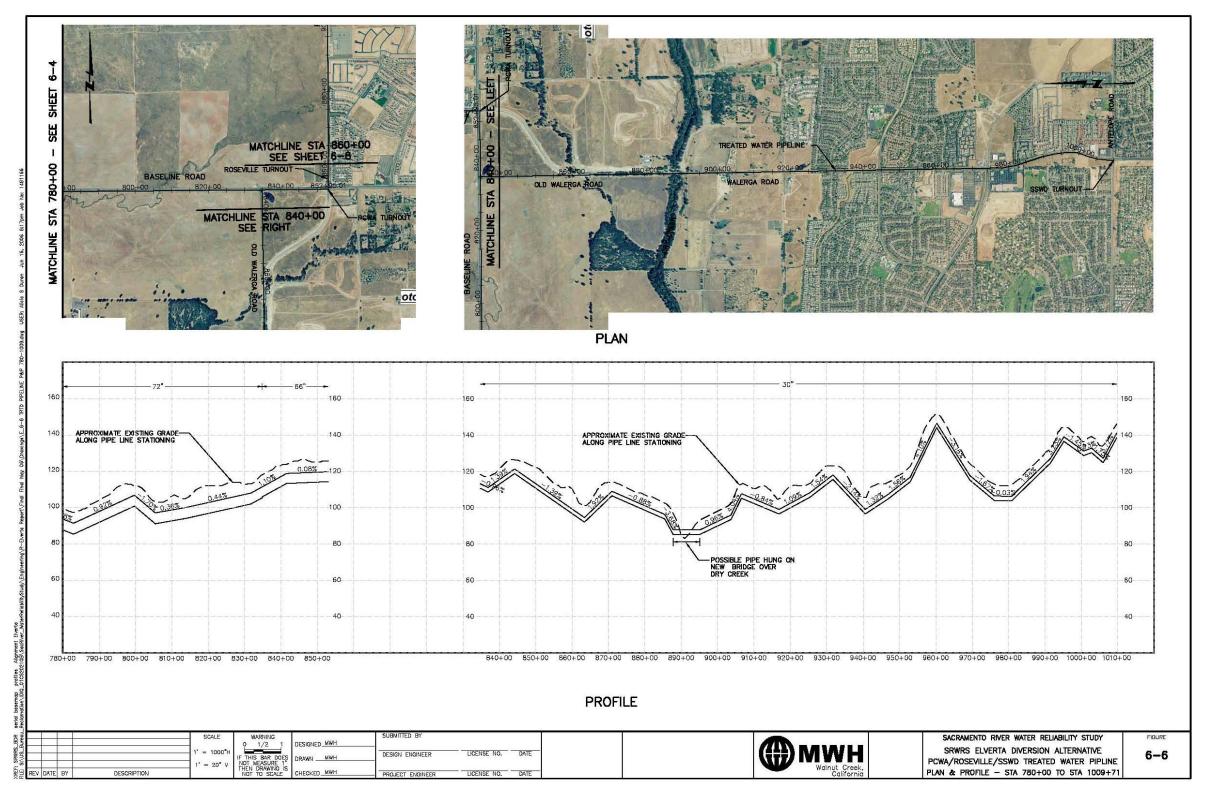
SRWRS Elverta Diversion Alternative PCWA/Roseville/SSWD Treated Water Pipeline Plan and Profile - STA 780+00 to STA 1009+71
